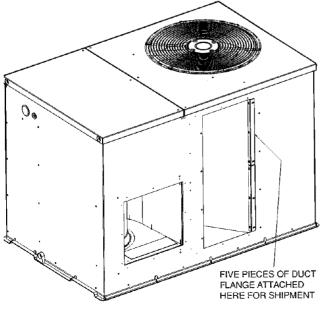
Shipping Location of Duct Flanges (Size 060 Only)
